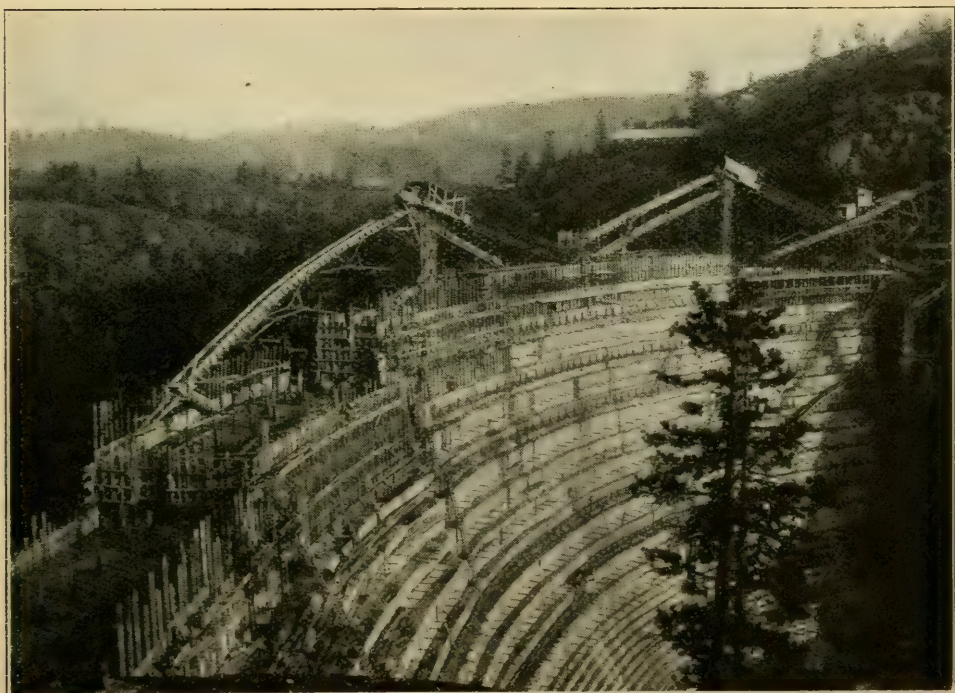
DOWN-STREAM VIEW OF LAKE SPAULDING DAM, SHOWING THE STEPPING-OFF AND IRON RODS FOR BOND.
